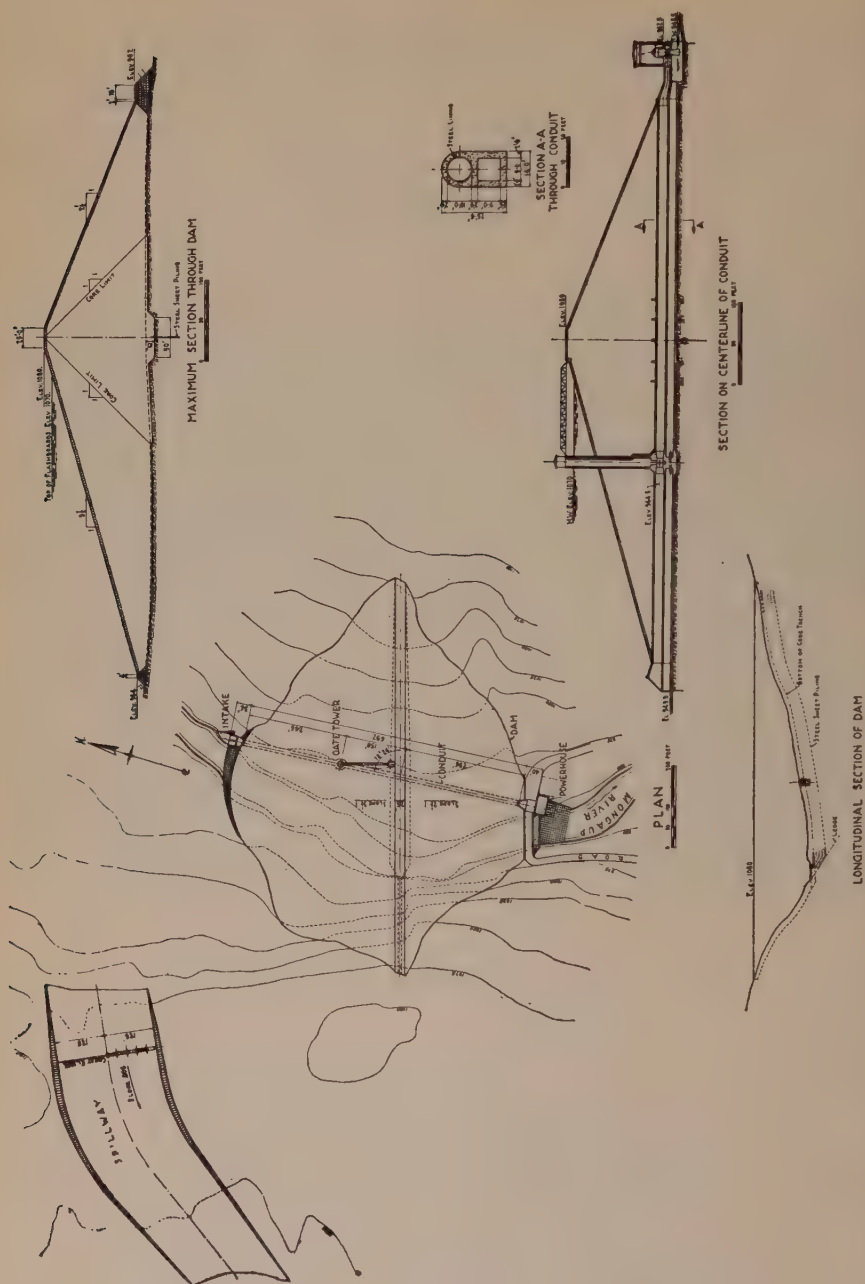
SWINGING BRIDGE DEVELOPMENT — PLAN AND SECTIONS
